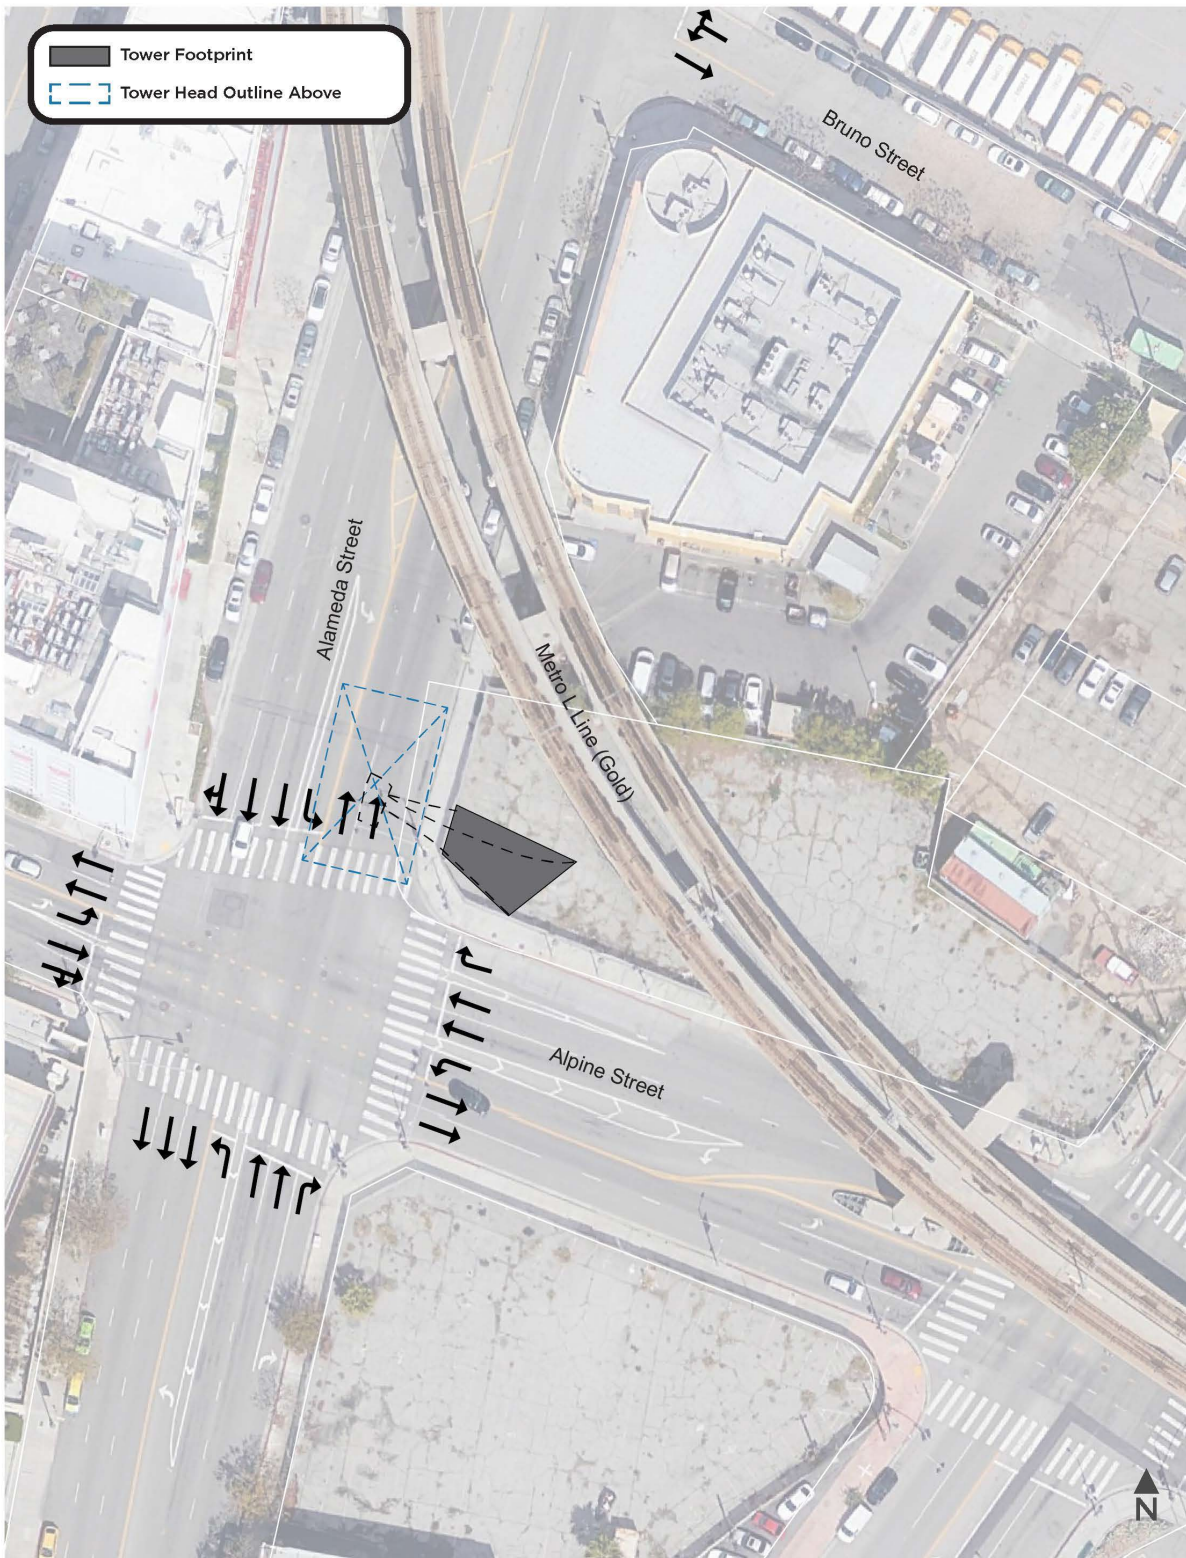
2-28: Alpine Tower Buildout Conditions
